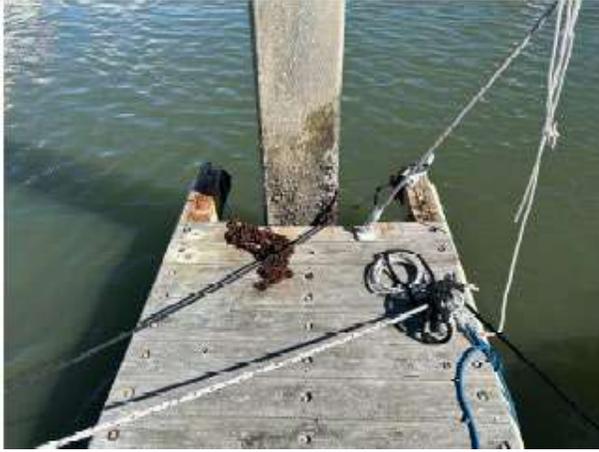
Site 4: A dock at A-G dock - missing tip of dock, damaged built-up beams, dock decking, pile guide, flat bumper rail, deck cleat and dock floats
